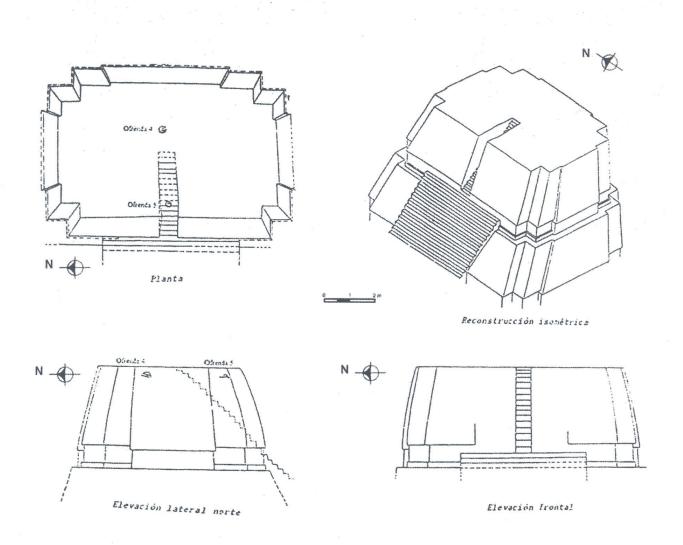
Plan, elevation, and reconstruction of Building 216 Sub 2, Yaxha.
